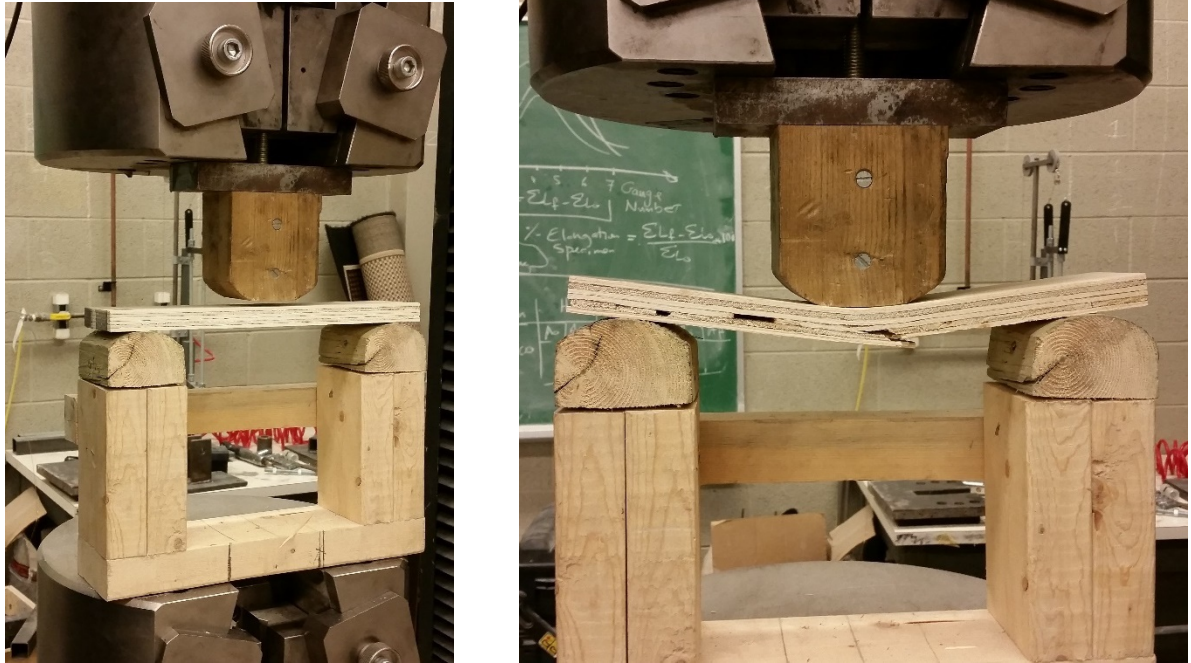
Typical test setup and failure mode for sheathing coupon tests
